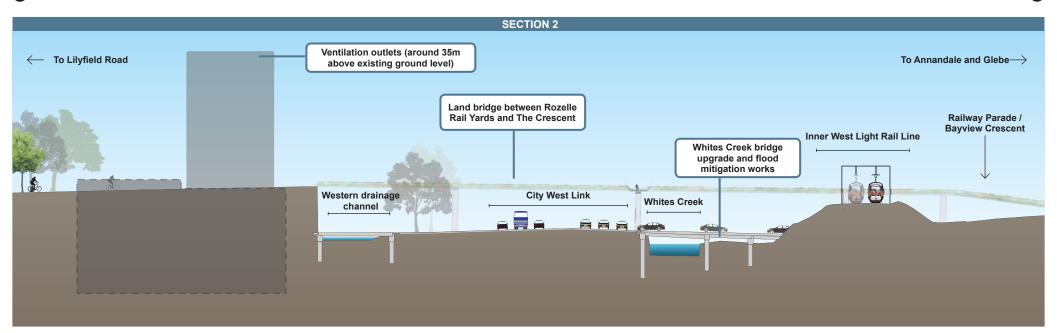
Long-section of the Rozelle Rail Yards - north-south - section 2
